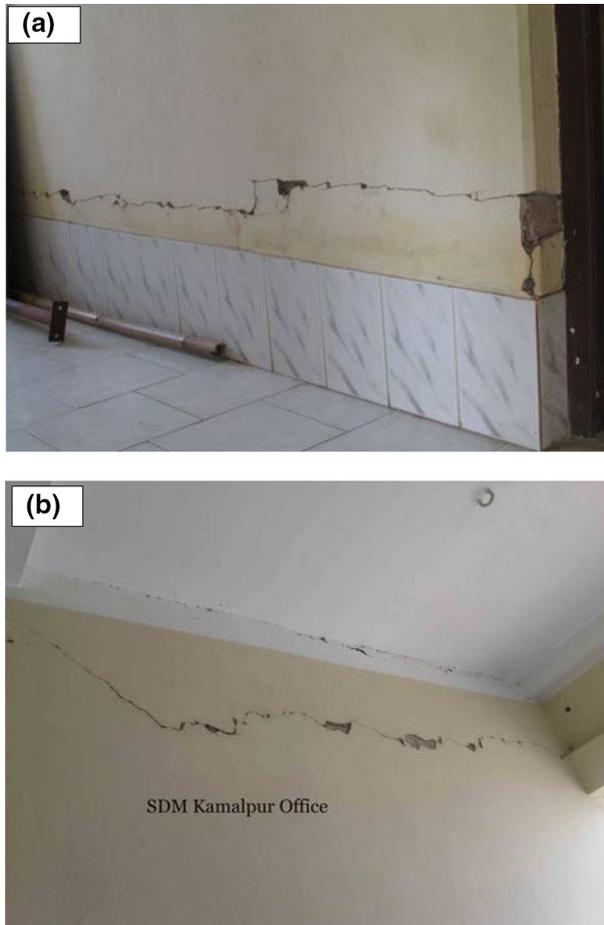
a, b Sliding shear failure at two-storied reinforced concrete frame buildings
